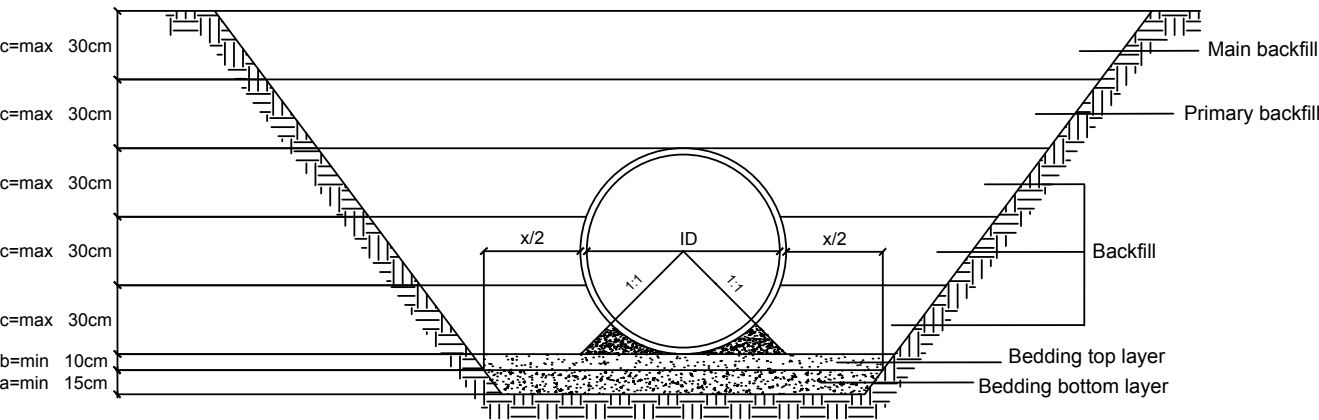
Laying the bedding and compacting the backfill when installing Pecor Quattro pipes.
